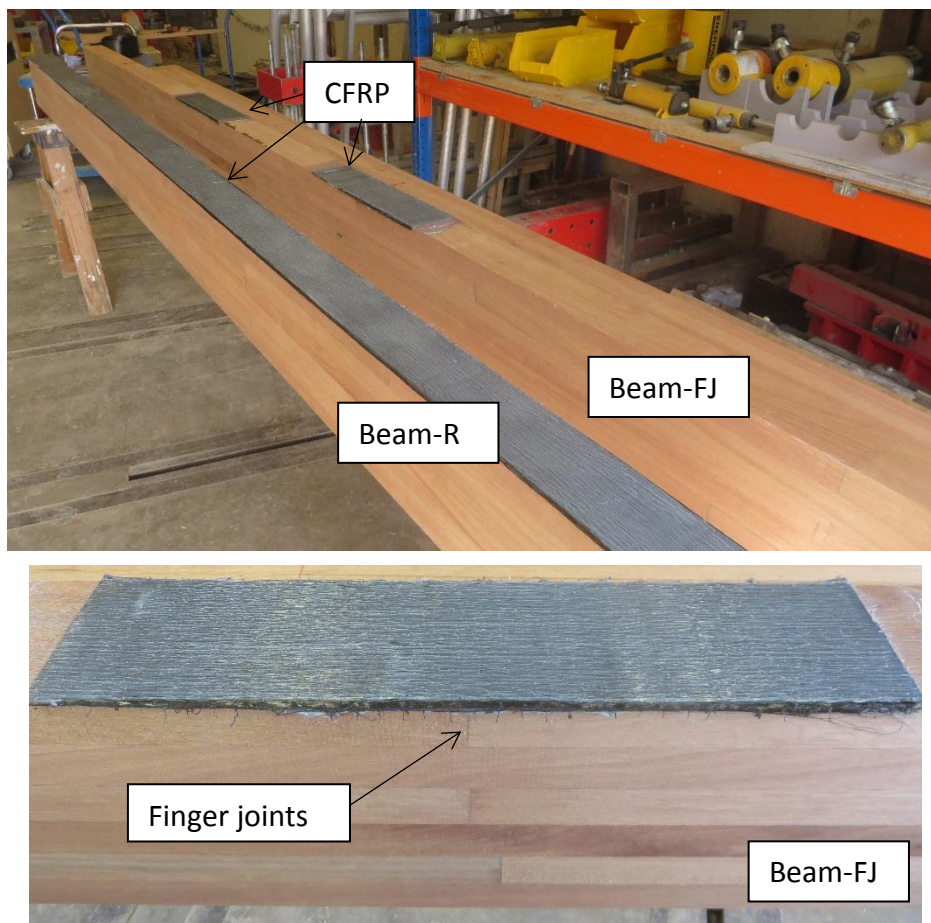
Glulam beams externally bonded with CFRP sheet
